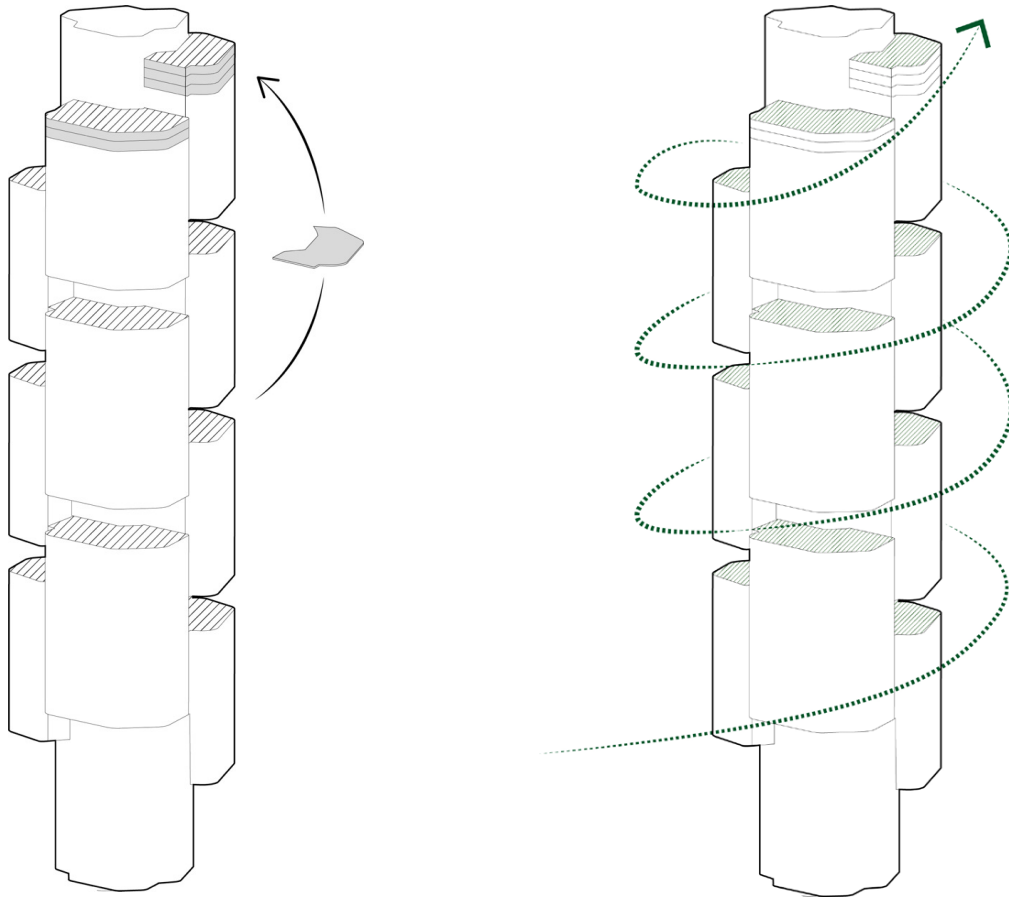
Diagrams illustrating modifications to the building's massing and new outdoor spaces.
